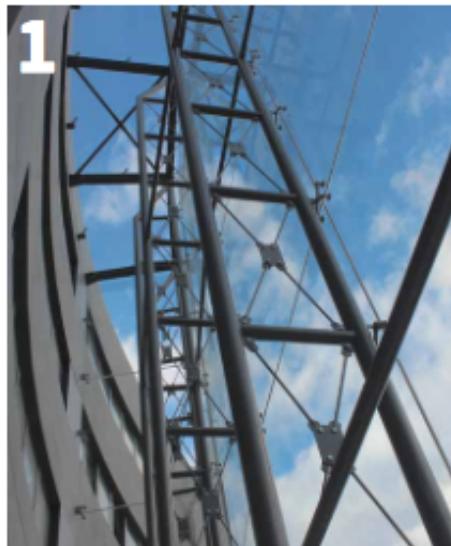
Steel supporting solution type "GL/SSS" (GLASSCON).
